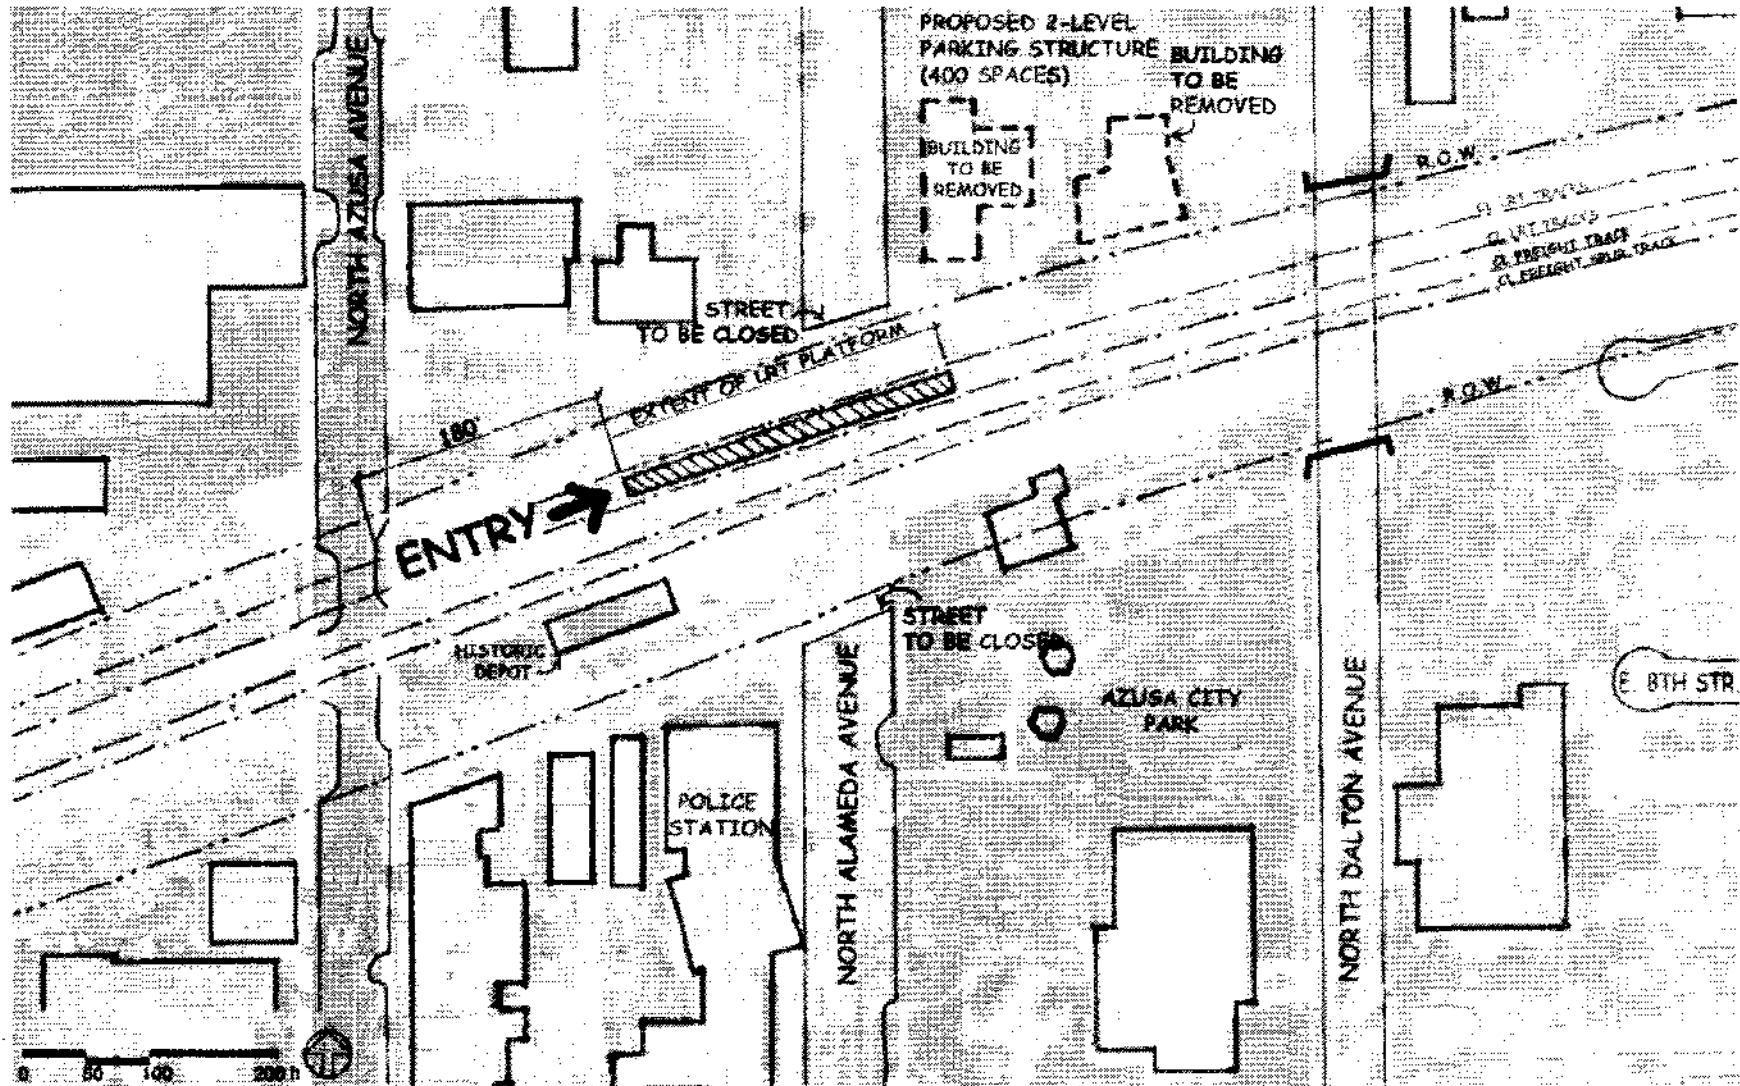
Site Plan: City of Azusa, Alameda Avenue Station
